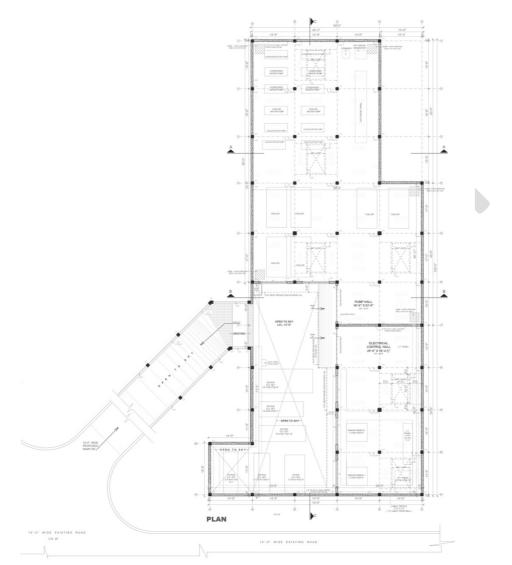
Proposed plan of the HVAC structures near the Secretariat Building © Engineering Department Union Territory Chandigarh
